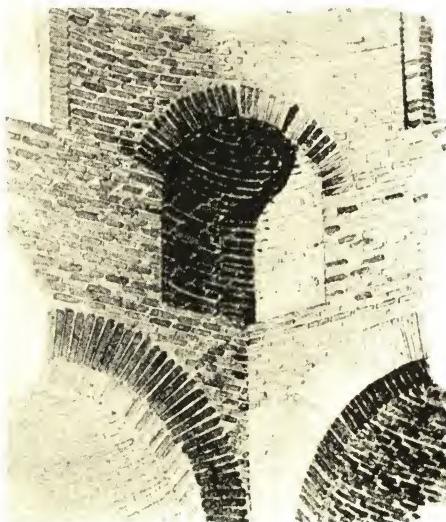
Concave Squinch Arch in San Vitale, Ravenna.
